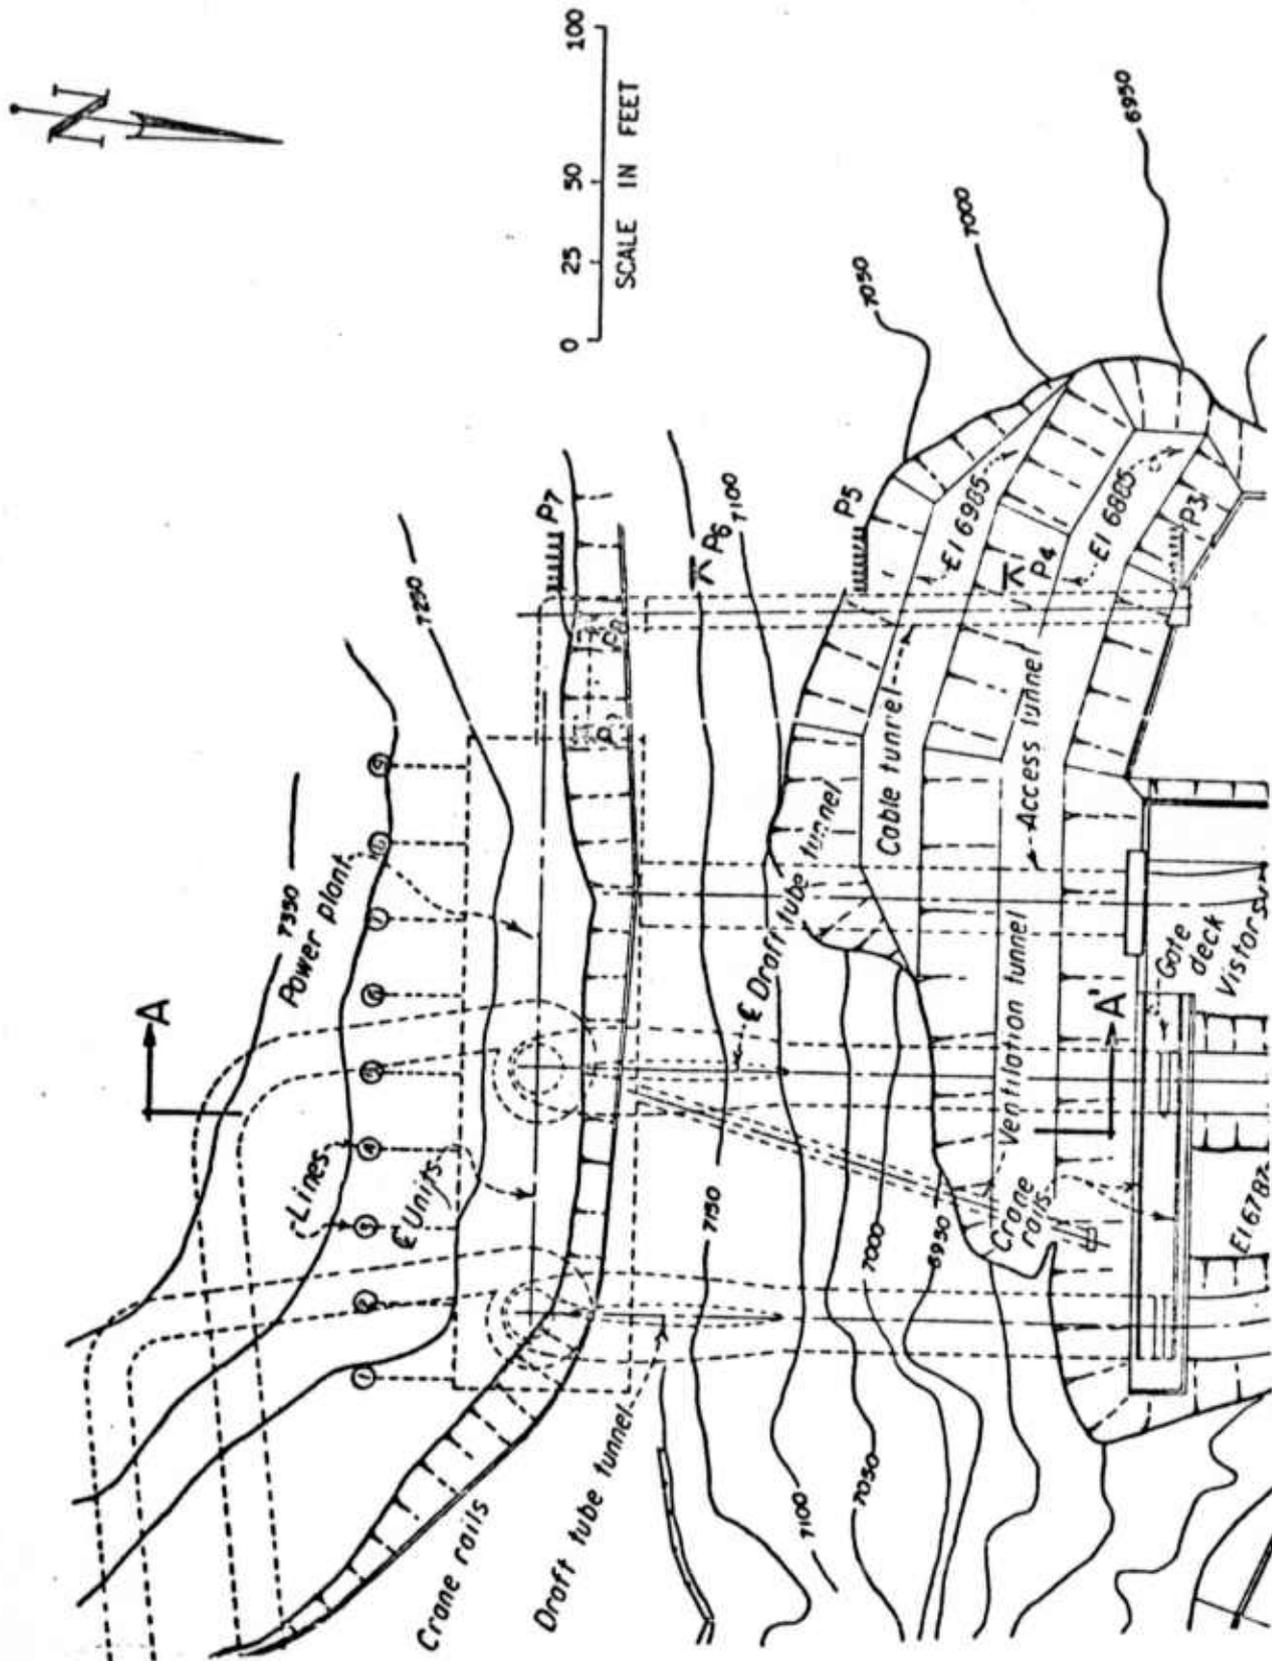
PLAN AND LOCATION OF MORROW POINT POWERPLANT (AFTER DODD, 1967)
